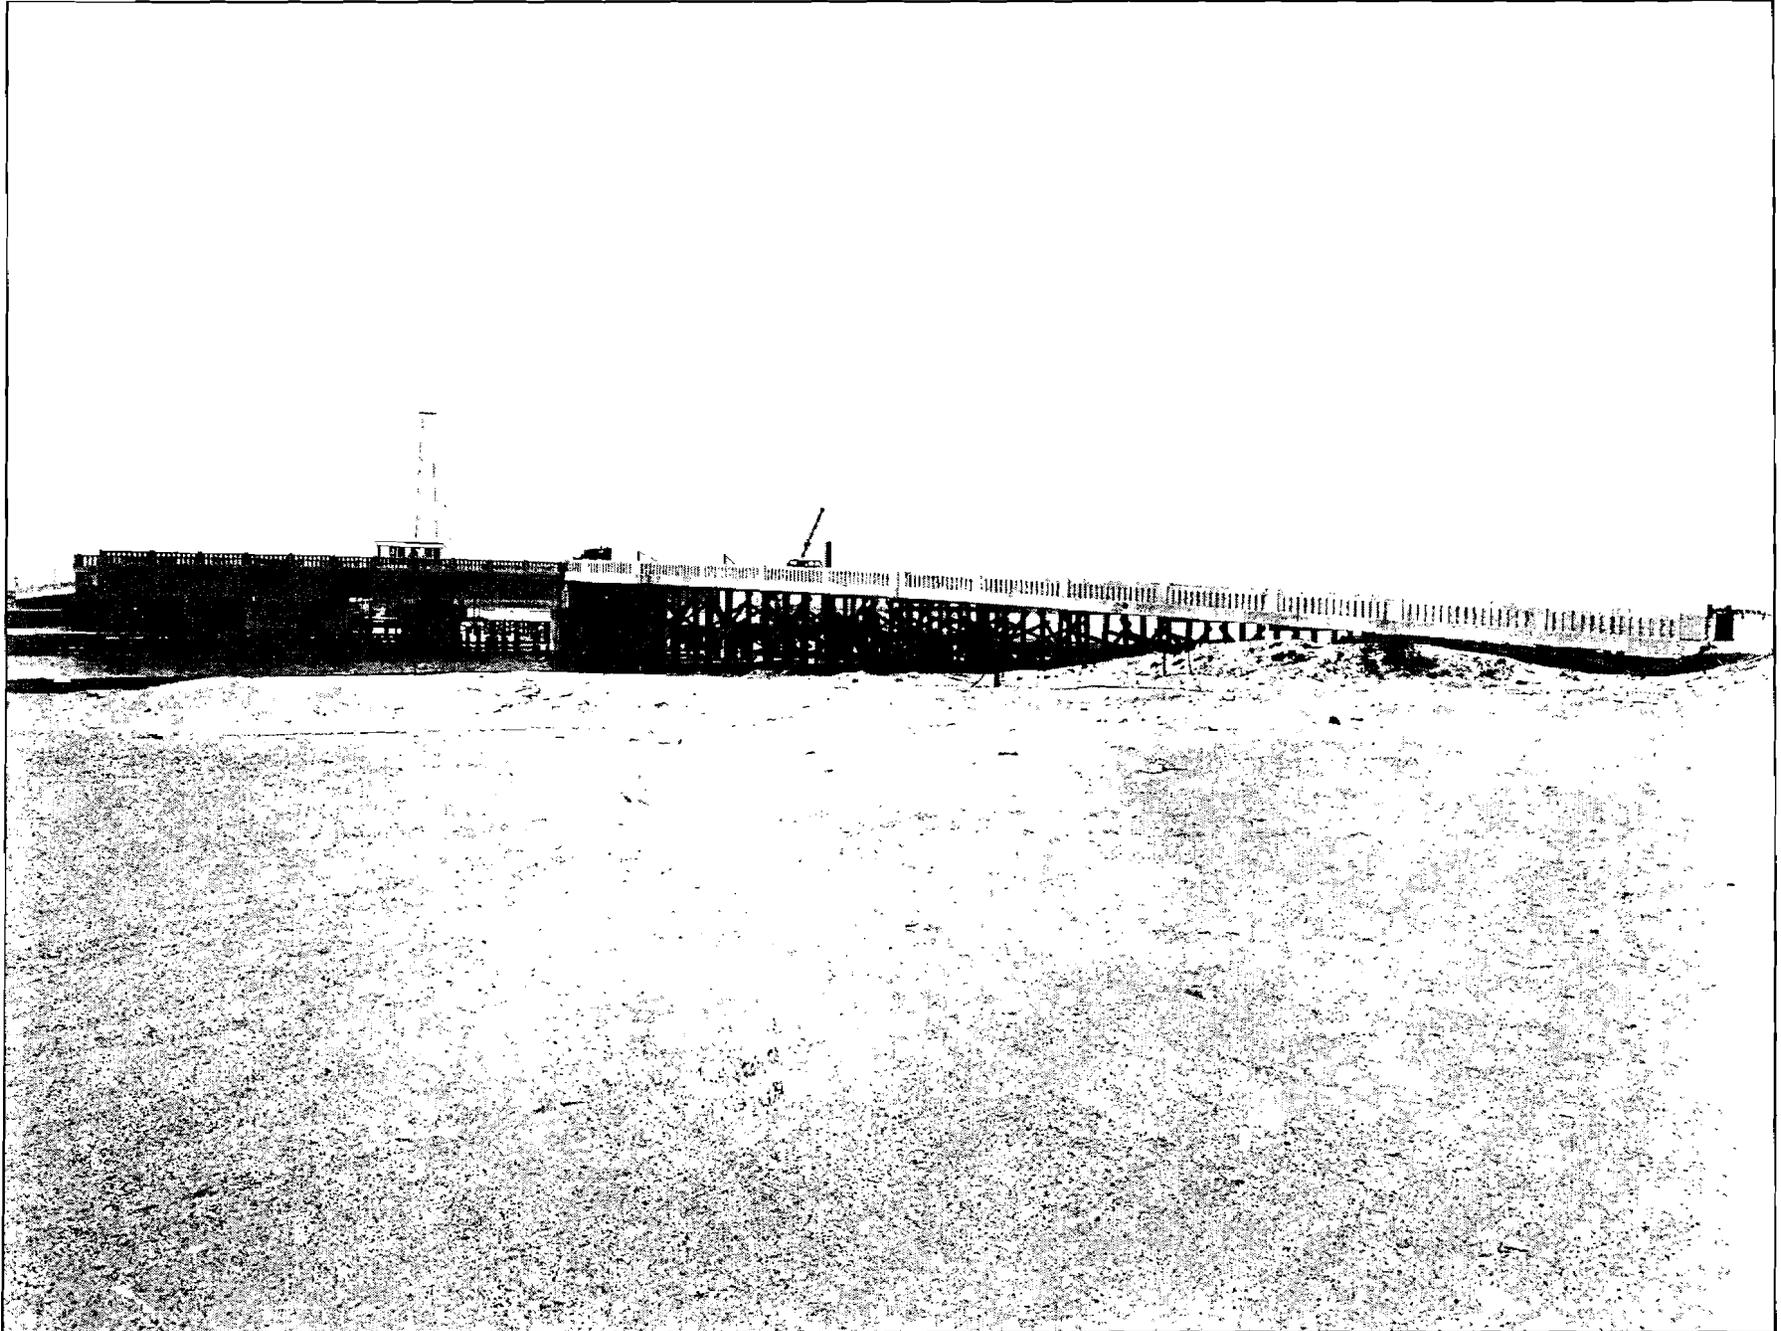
Cullen Bridge. North approach toward southwest. June 21, 1940. Delaware State Highway Department collection. Image #0327. Delaware Public Archives, Dover.
